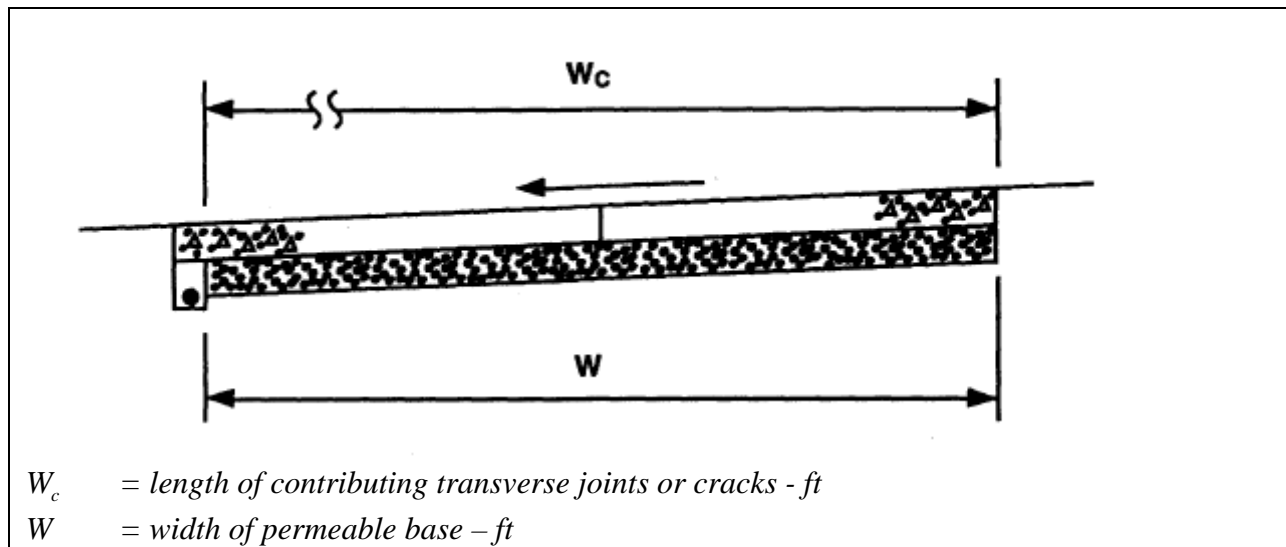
Crack layout - sectional view (ERES, 1999).
